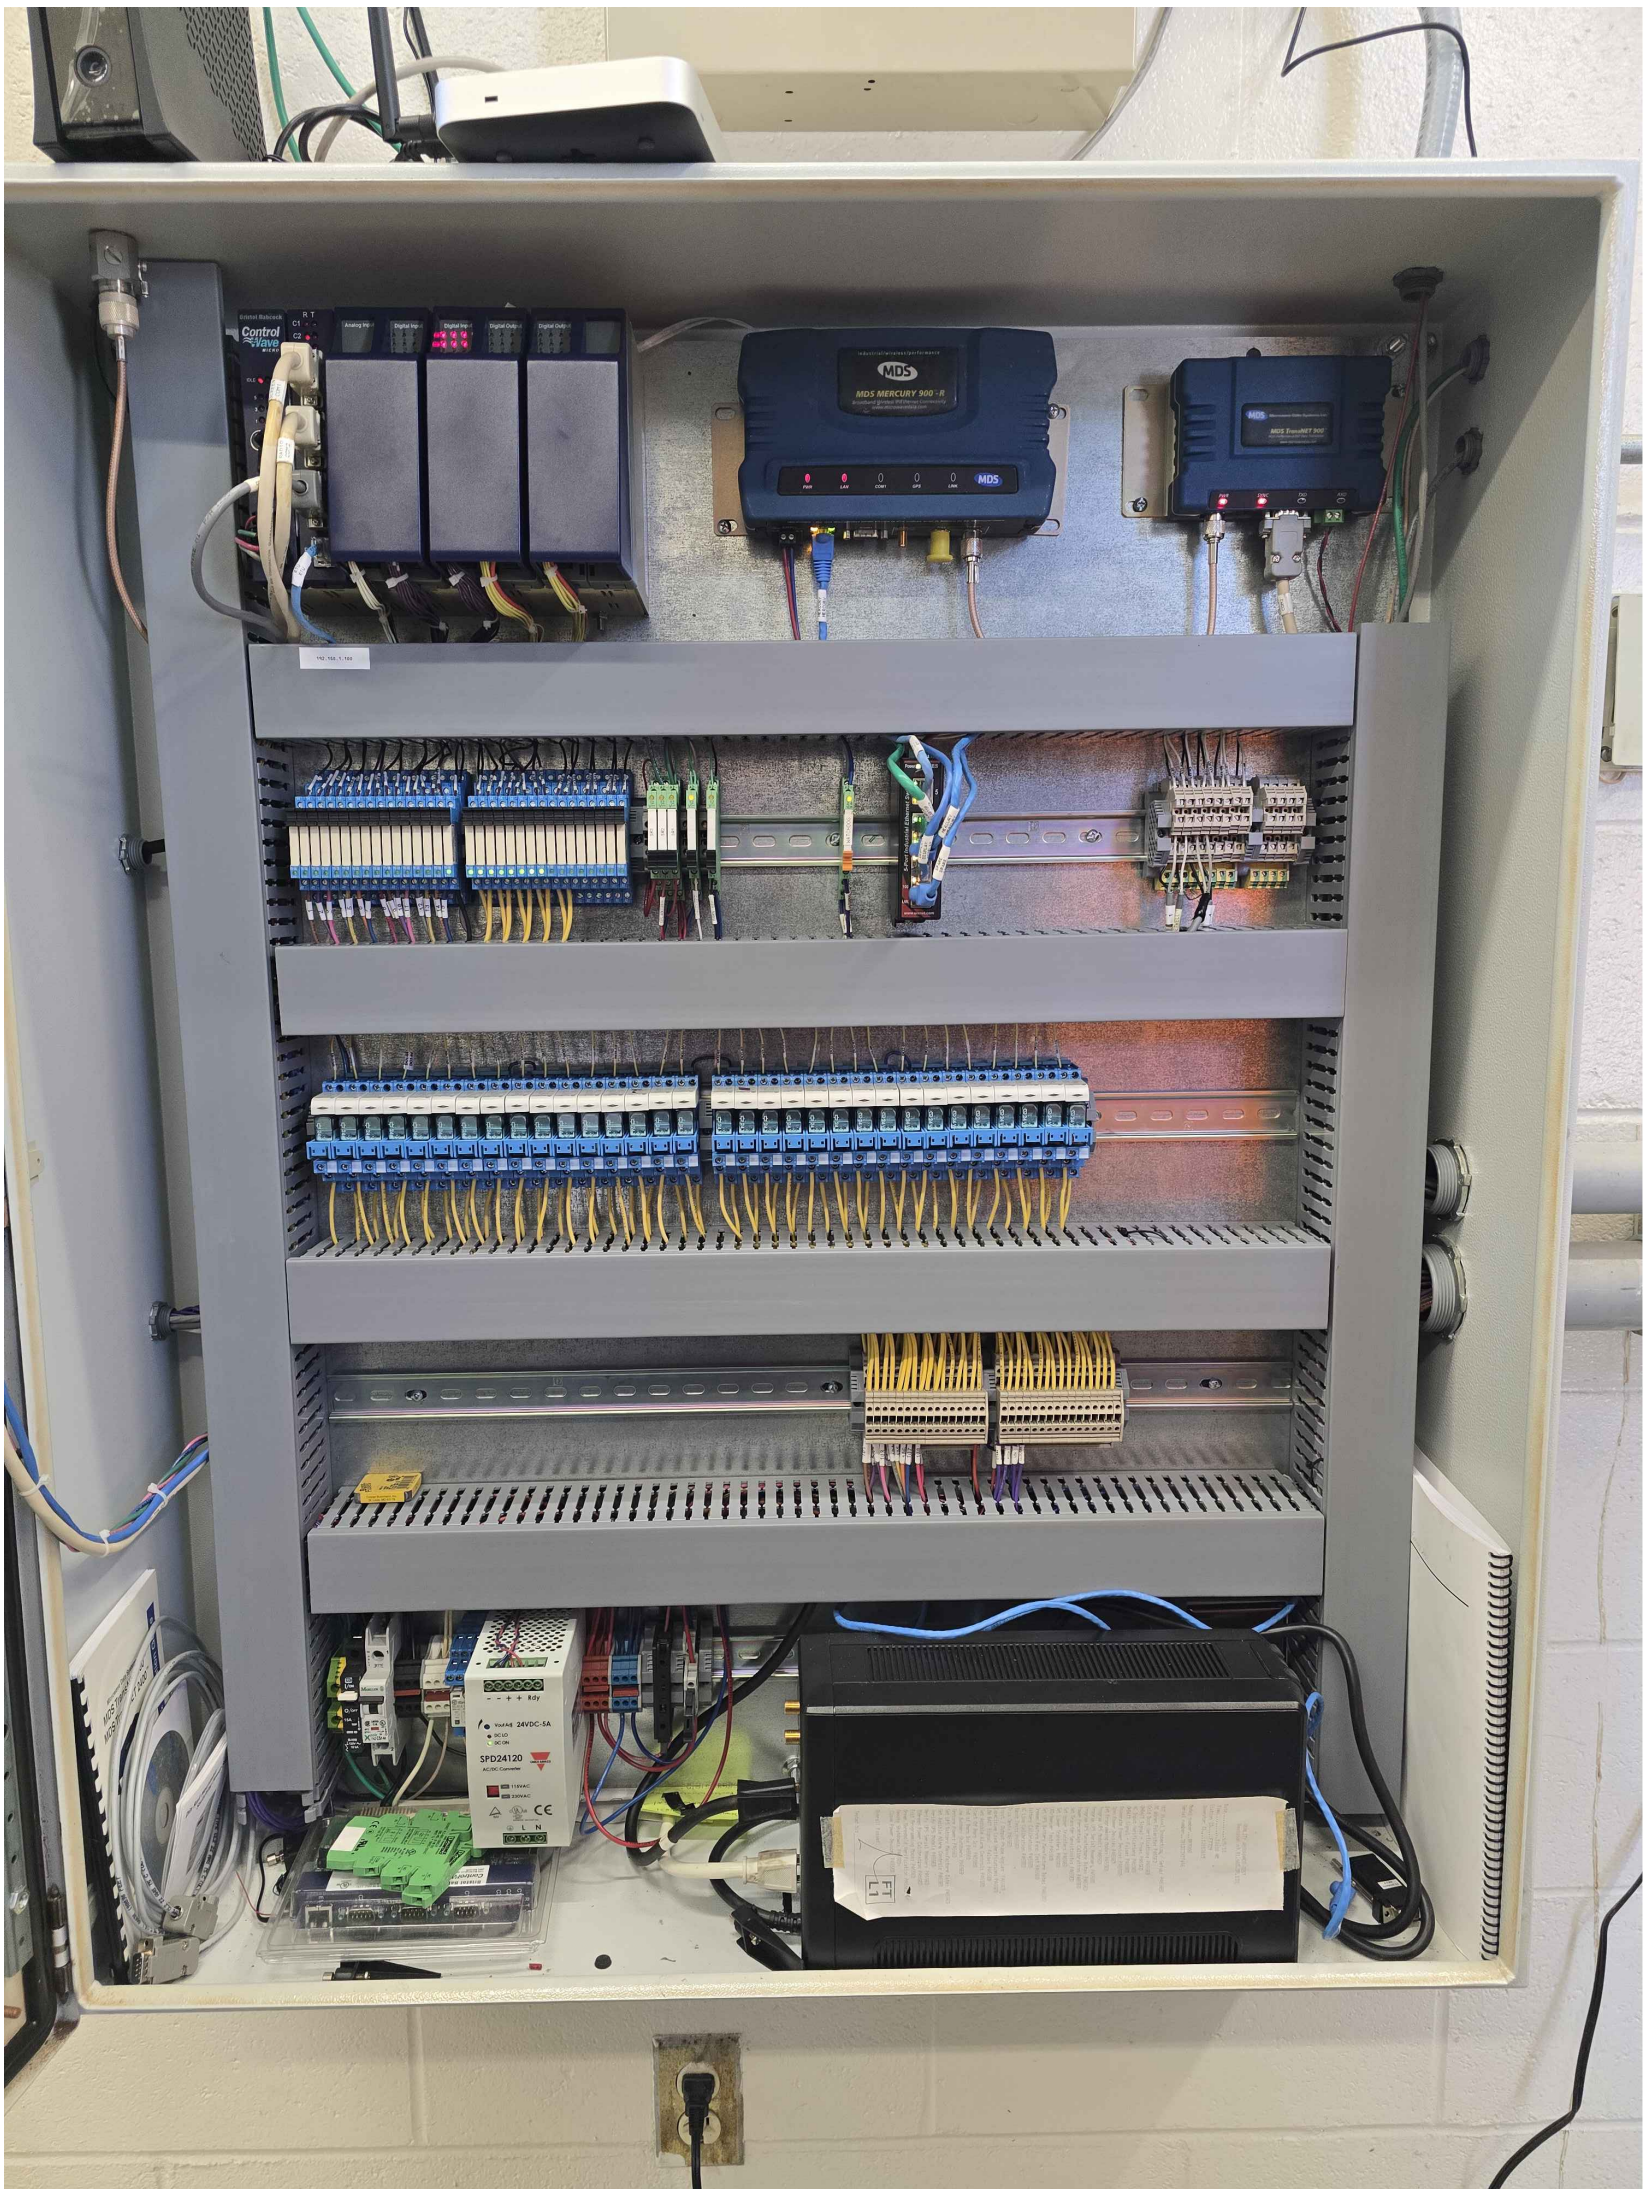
PHOTO OF EXISTING NORTH PLANT PLC PANEL
